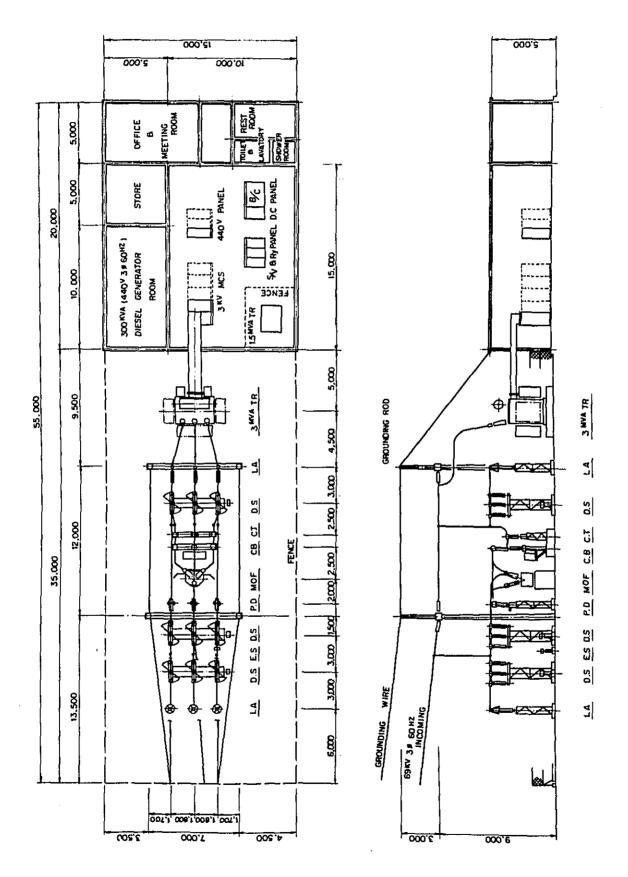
Layout of Substation, 69KV, 3MVA
